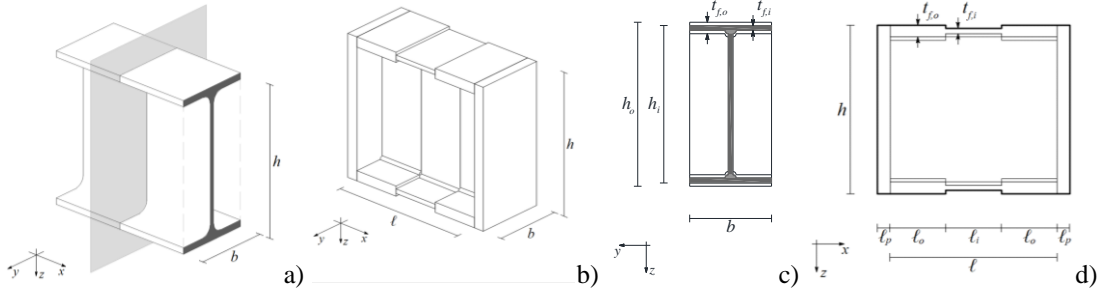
Sketch of LRPH device: a) Typical I-shaped steel beam element; b) 3D view; c) typical cross-section; d) lateral view.
